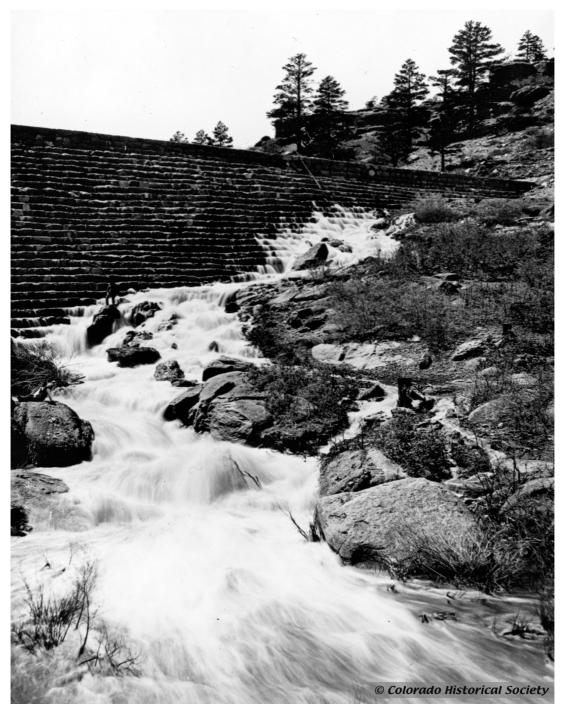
High amount of seepage through dam on left abutment, prior to reconstruction. Outlet pipe is just out of view to left of photo (Colorado Historical Society).
